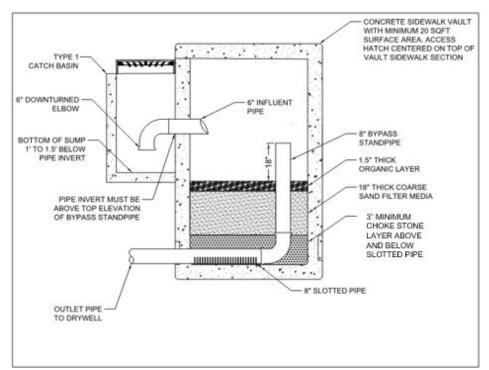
Cross Section of Revised Sand Filter in Sidewalk Vault Design
